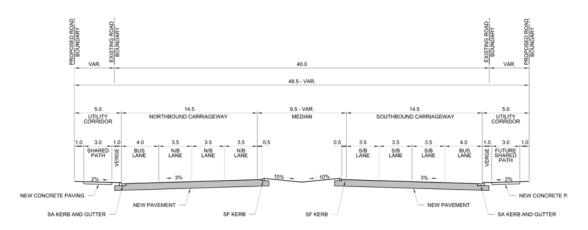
The proposed works - typical cross section between Bradley Street and Glenmore Parkway (source: Jacobs 2016)
